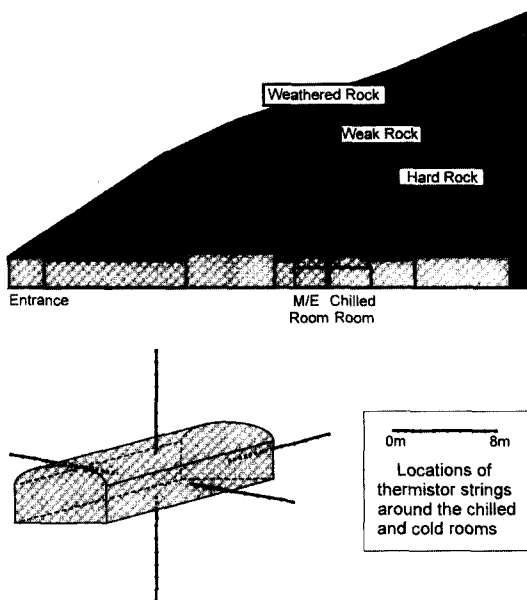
Section view of cold storage pilot plant and installation of thermistor strings
